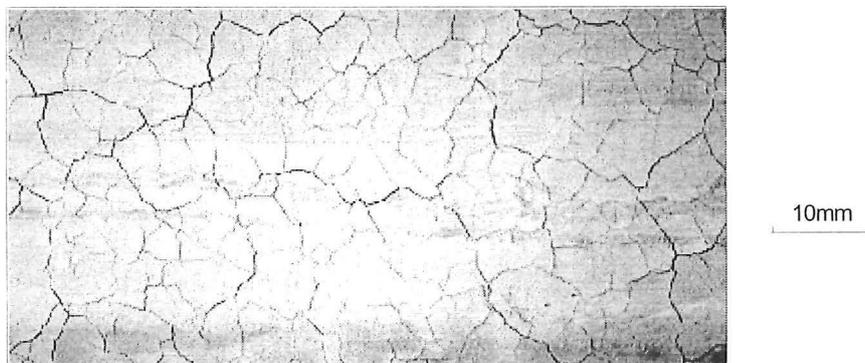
Cracking that occurred during cooling of 60mm high strength specimen.
